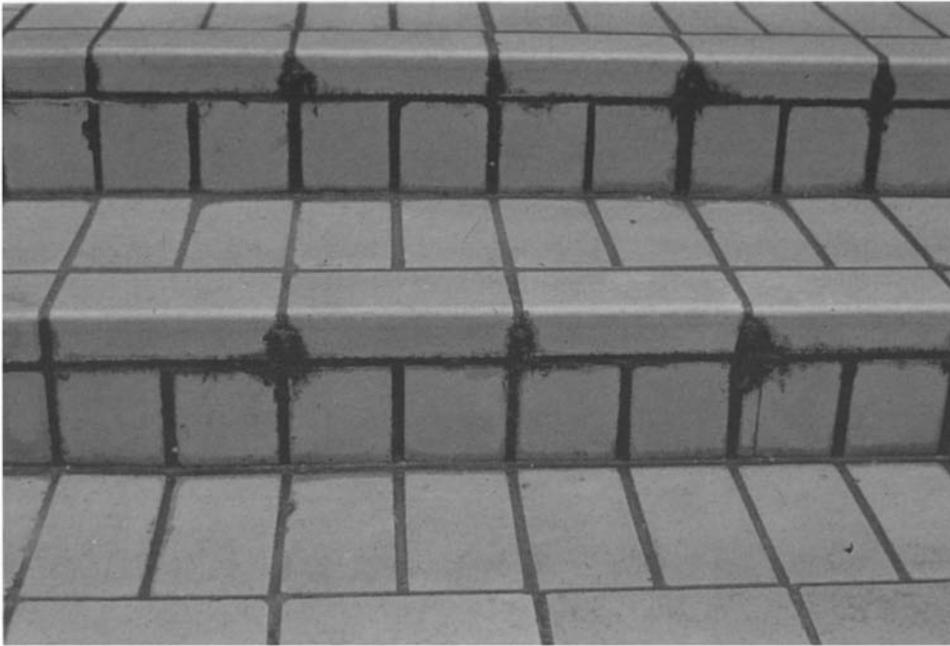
Entrance stairs to a leisure centre constructed from pre-formed dressed stone risers and treads.
